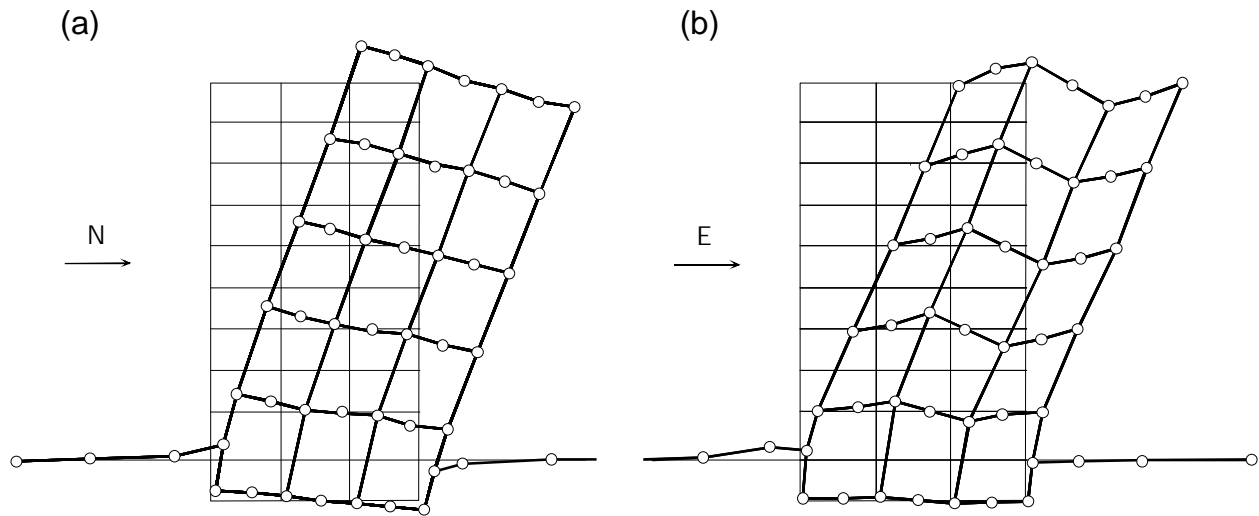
Deformation of a nine-storey reinforced concrete building excited at the roof by a shaker with two counter rotating masses [11] (a) along the west shear wall, and (b) along a section through the elevator core.
